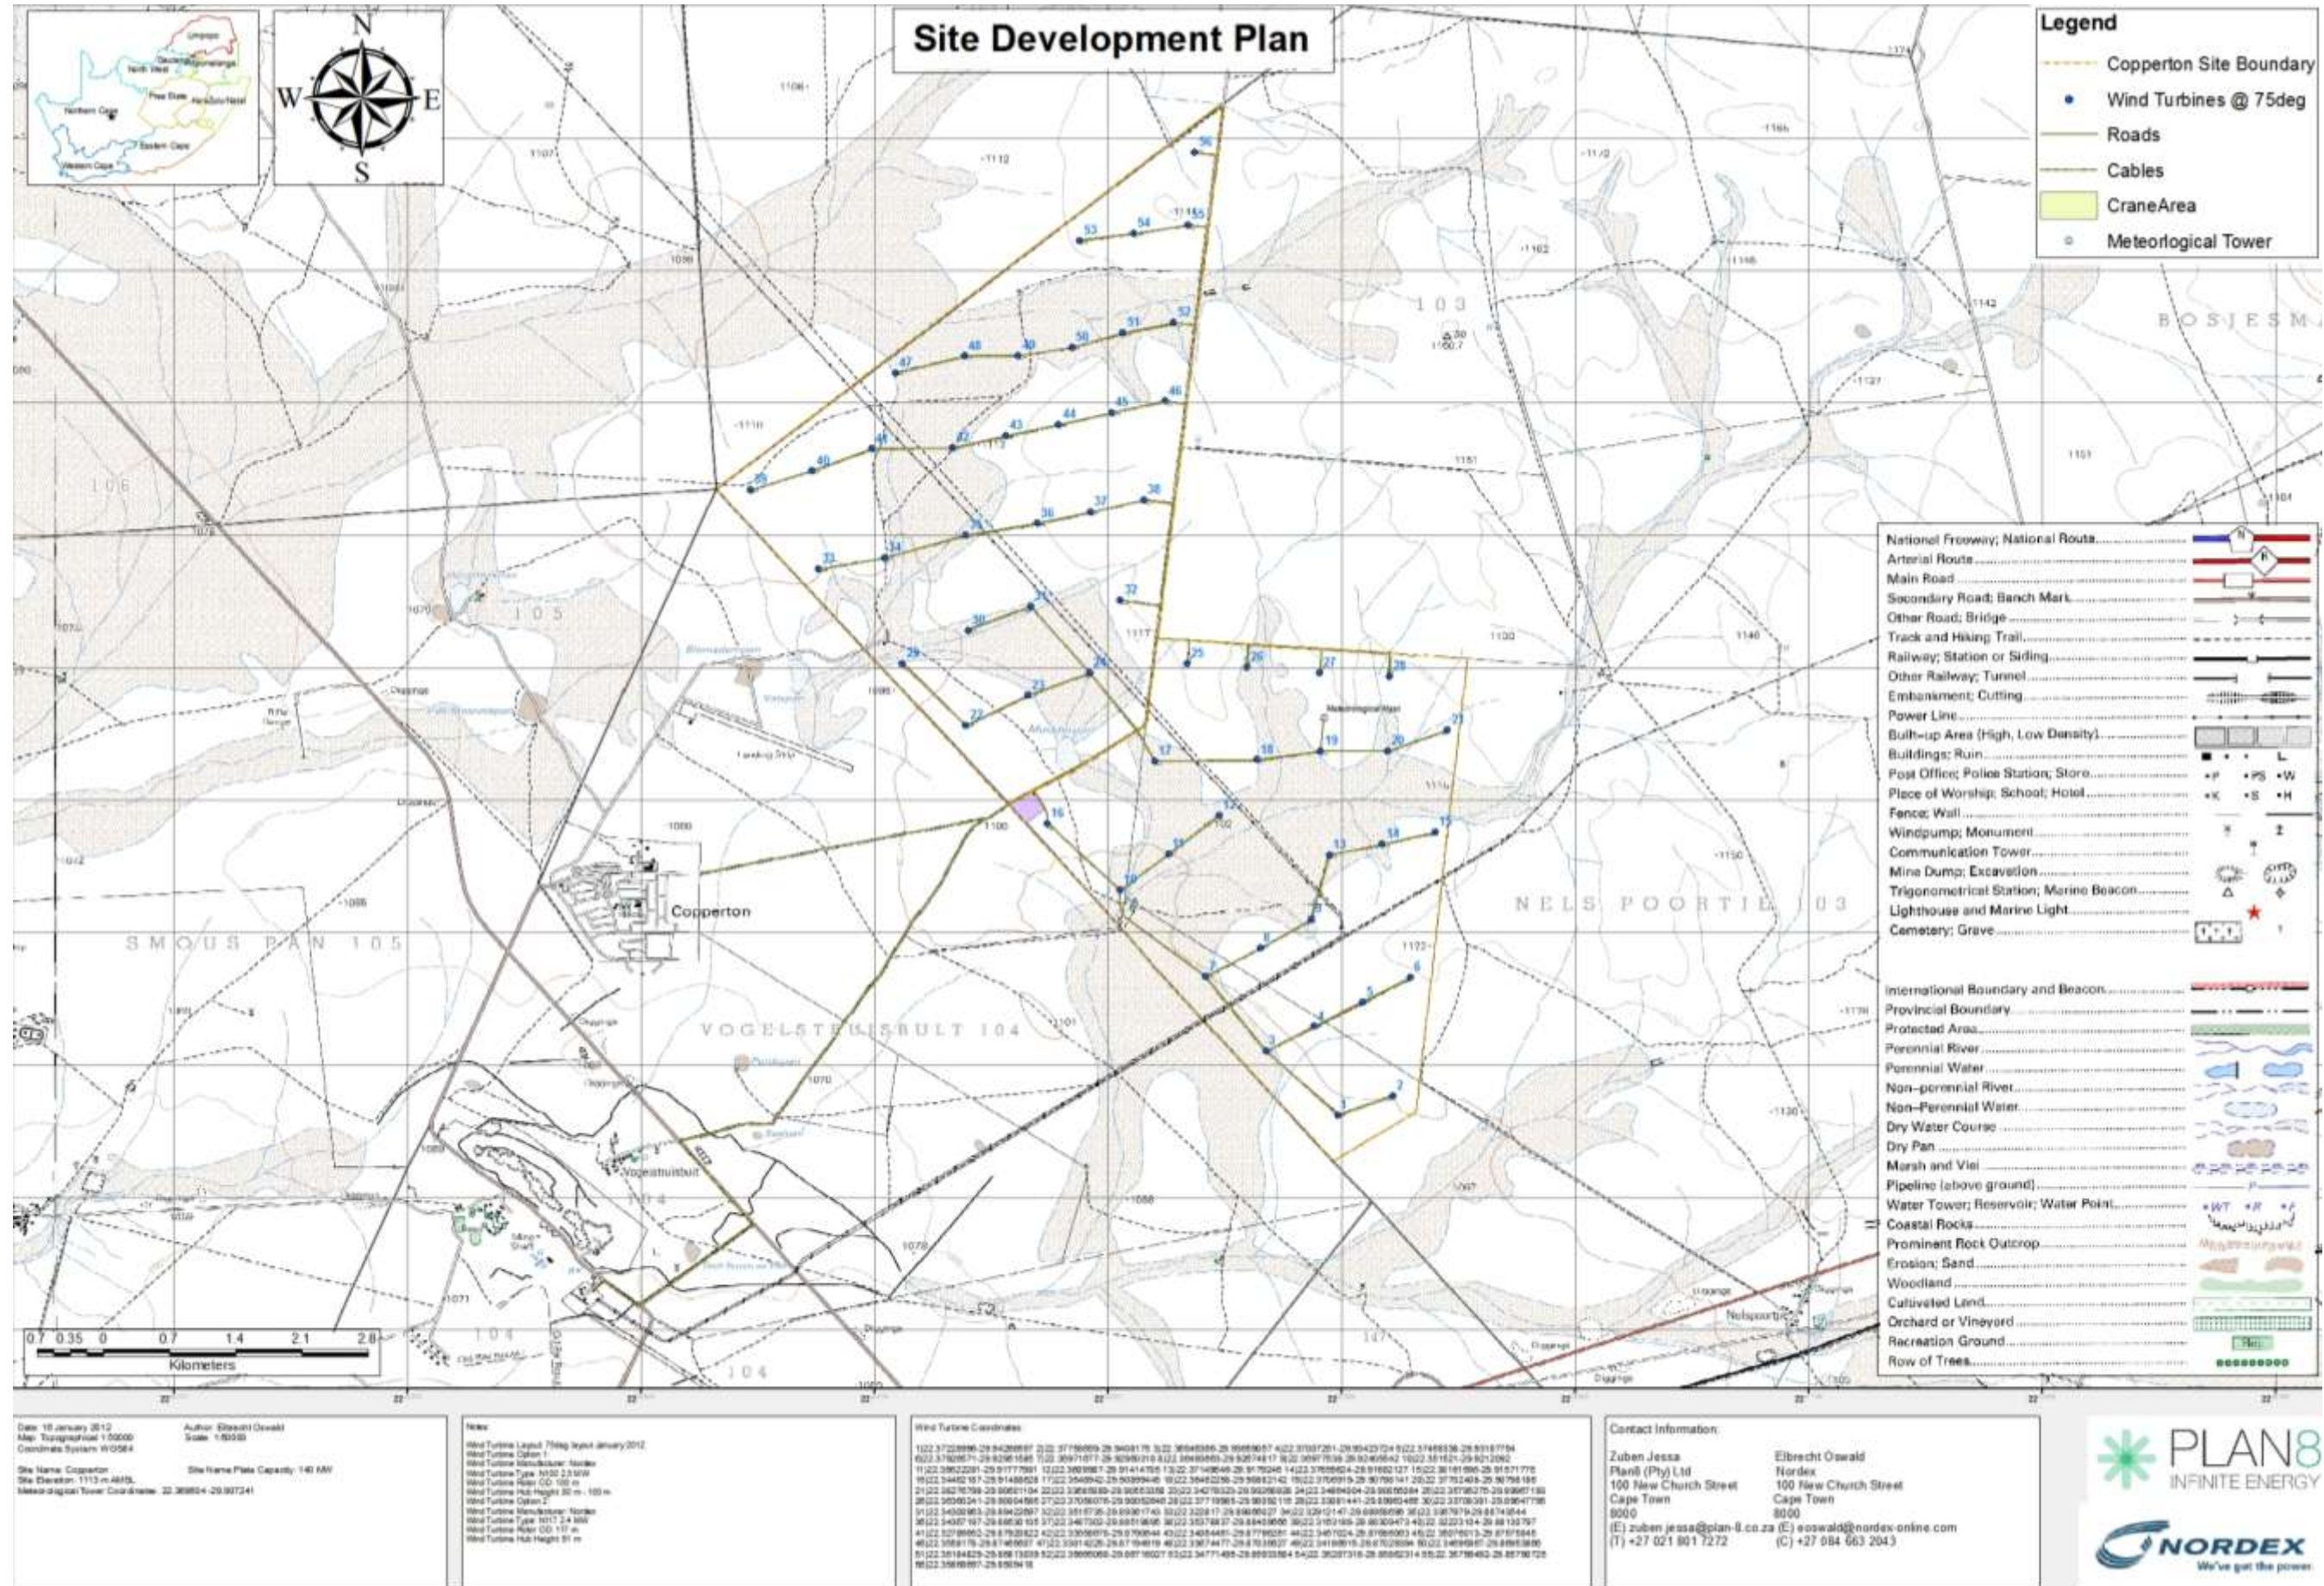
Preferred layout, dated October 2011, for the proposed wind energy facility (Source: Plan 8, Nordex)
